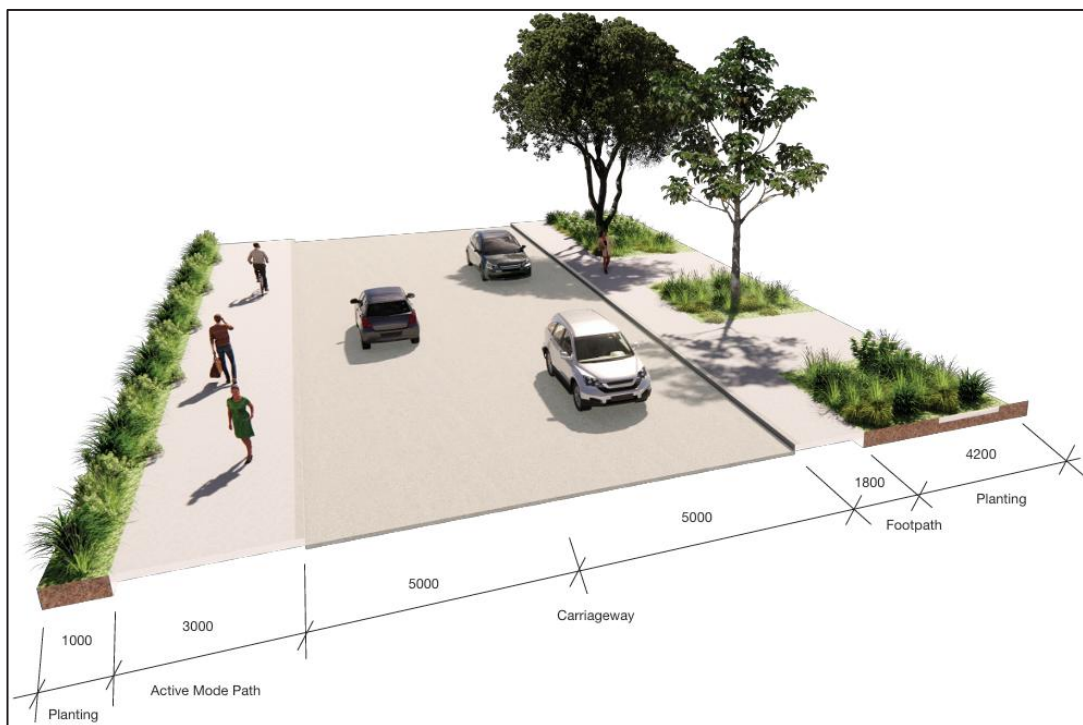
Jack Lachlan Drive Cross Section – Segment C
